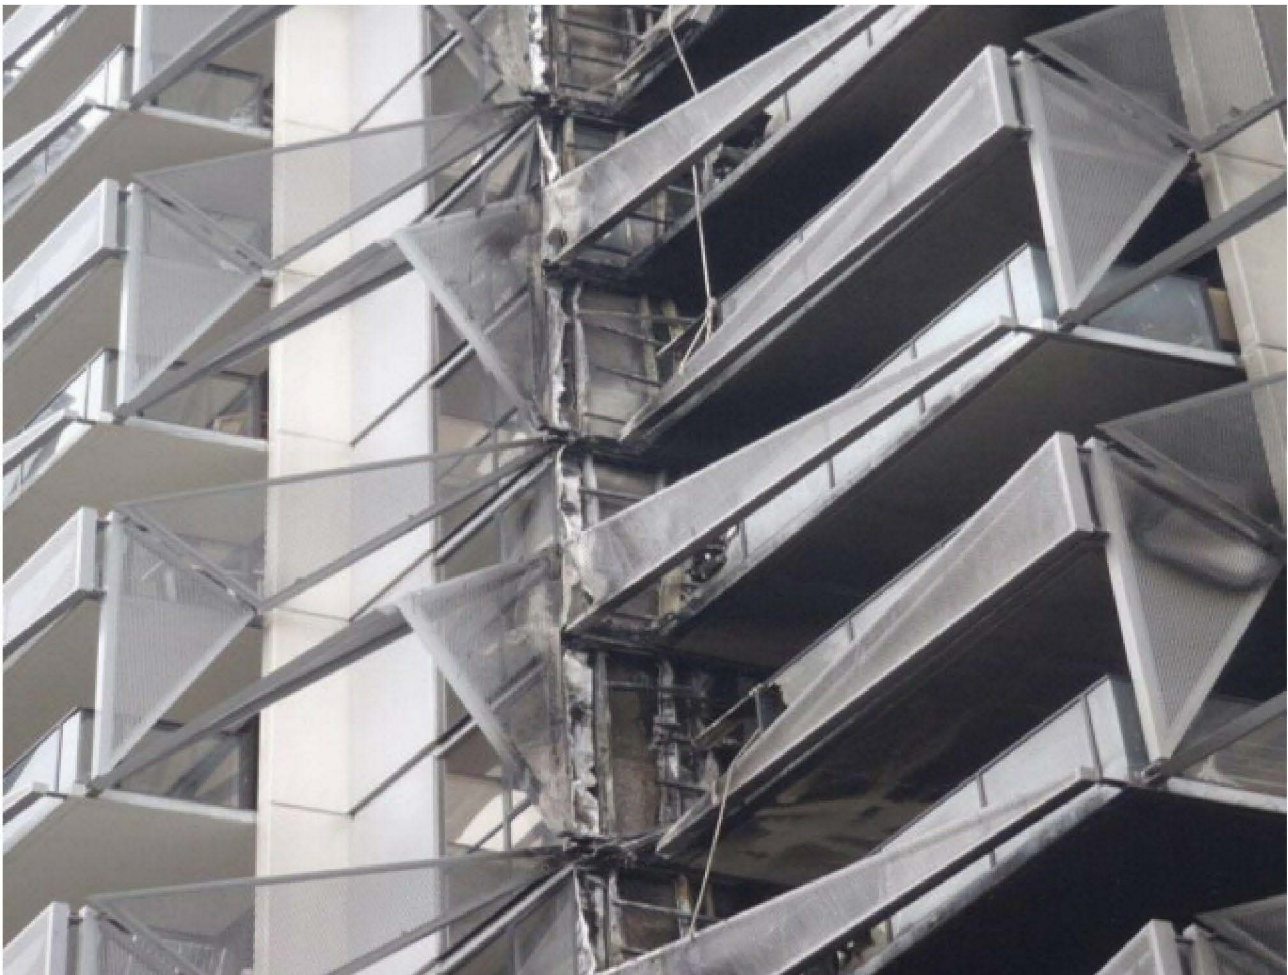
Fire damage to the external wall cladding and ornamental structures
